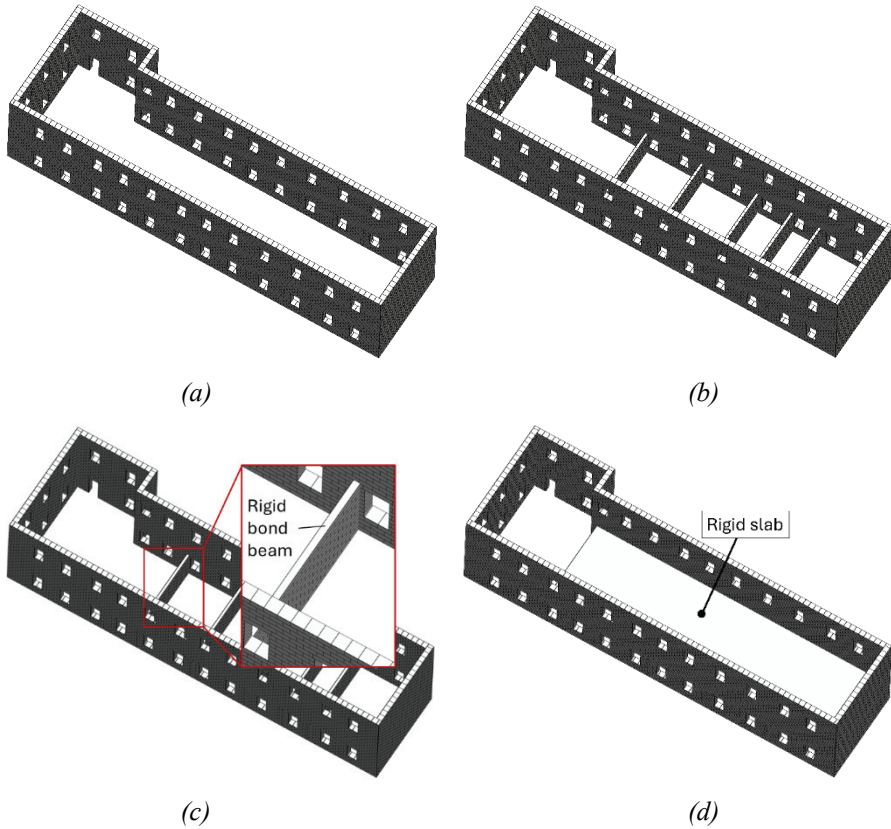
Proposed structural configurations for the Mithatpaşa Building: (a) no internal walls, (b) addition of the interior walls, (c) implementation of continuous rigid beam between two façades, and (d) interior wall + rigid slab.
